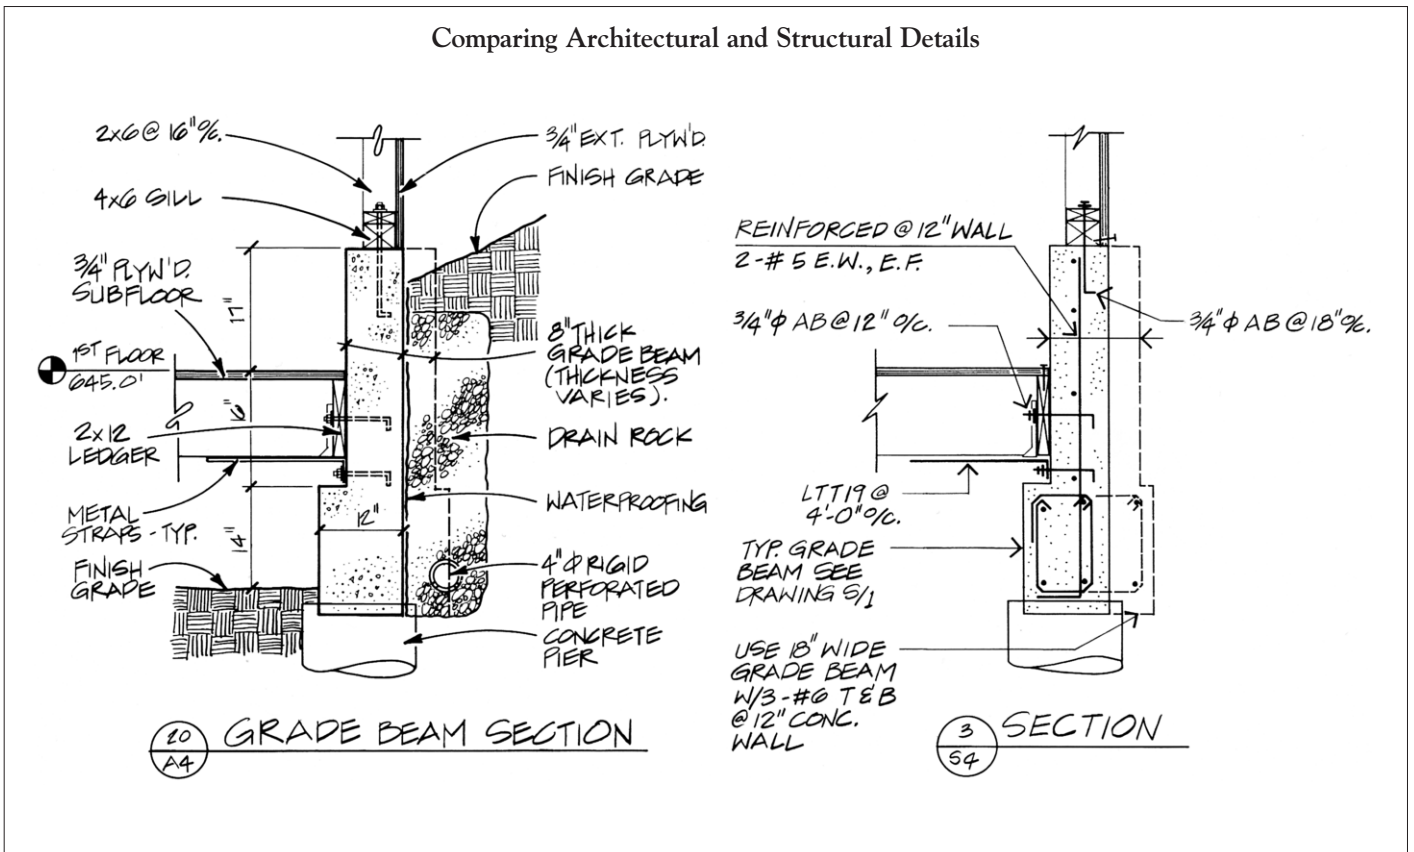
Architectural and structural plans are often drawn by two different people. Make sure dimensions and notations on architectural details (left) agree with structural details (right), which are more schematic. For example, the structural drawing specifies the diameter and on-center location of anchor bolts for the joist system, but you must read the architectural drawings to determine their elevation. Similarly, the architectural drawing shows "metal straps typical," while the structural drawing specifies the exact piece of hardware to use.
